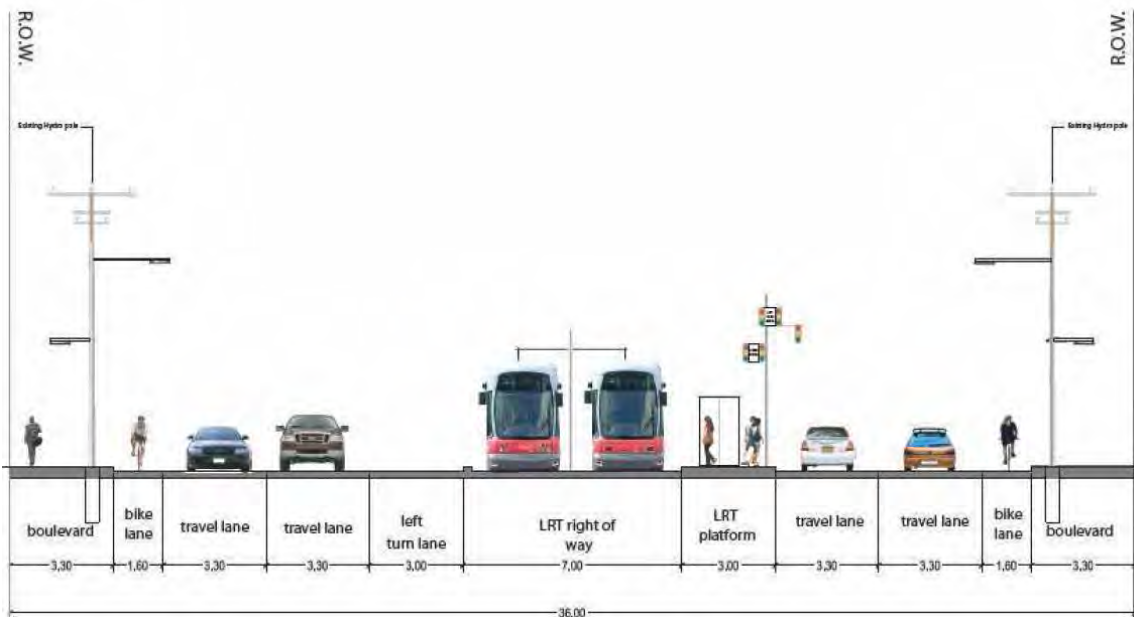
Sheppard Avenue Urban Cross-Section at Intersections (Sheppard East LRT EA)
